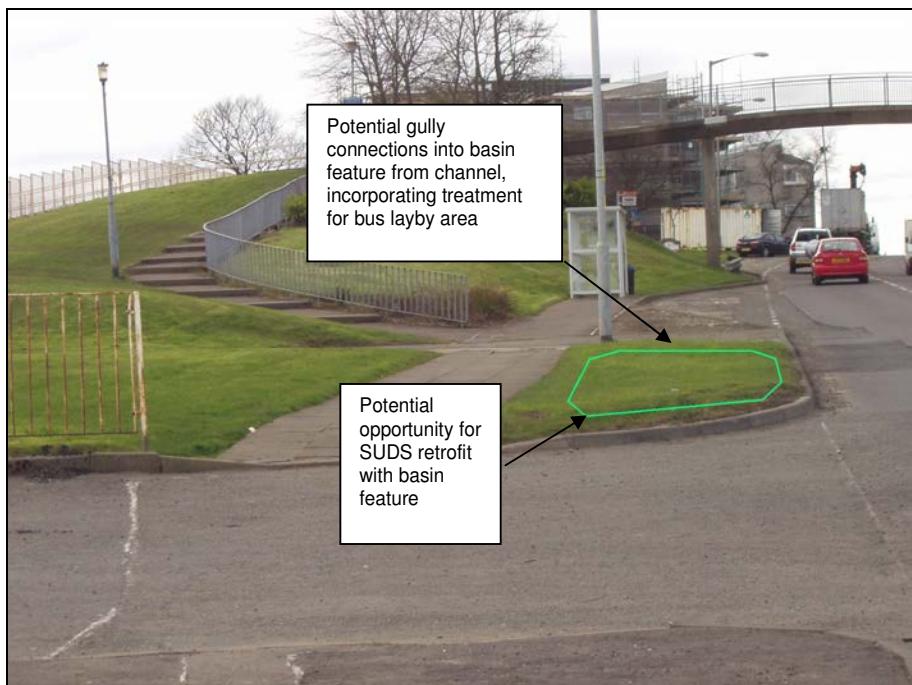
SUDS Retrofit in Road Build-out/Bus Layby, South Lanarkshire
